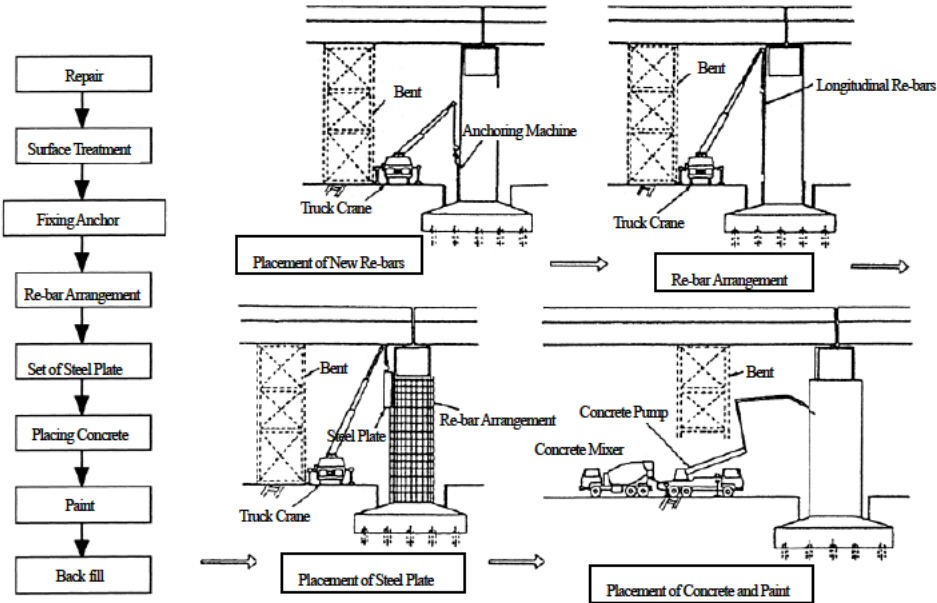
Combined Method of Reinforced Concrete and Steel Plate Jacketing Method
